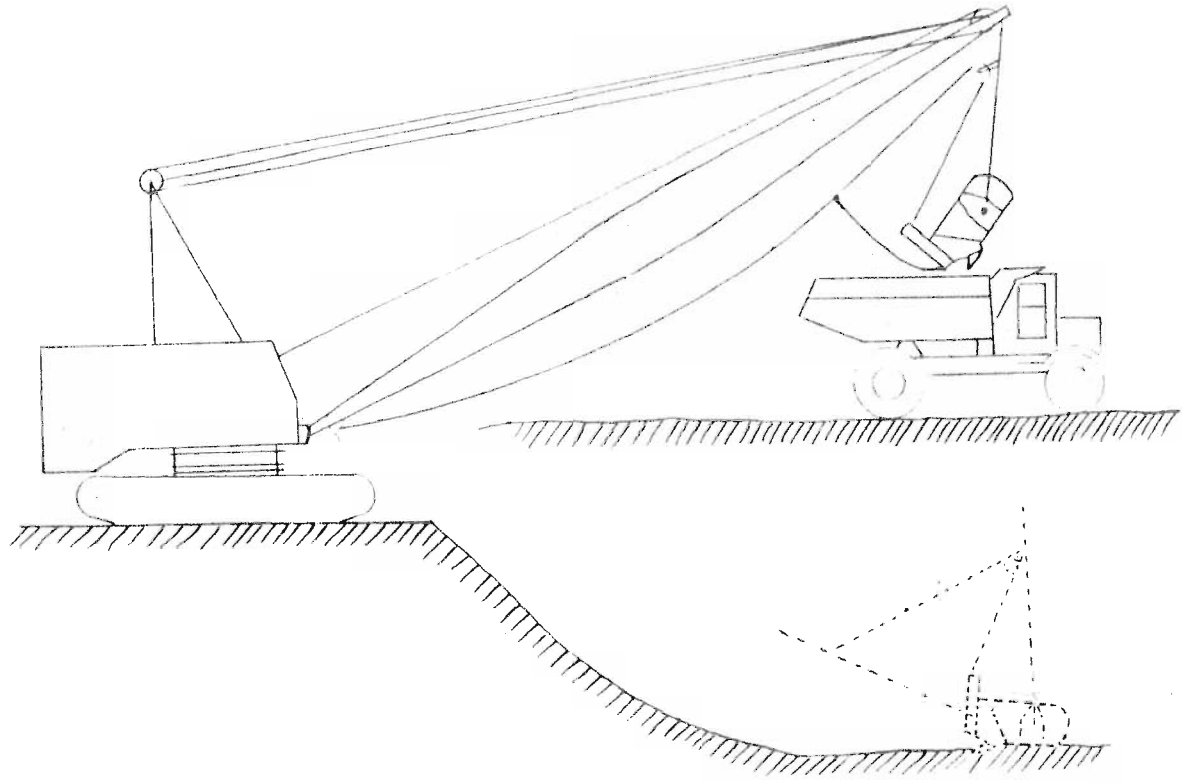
Digging from below dragline and loading to trucks above to gain elevation.
